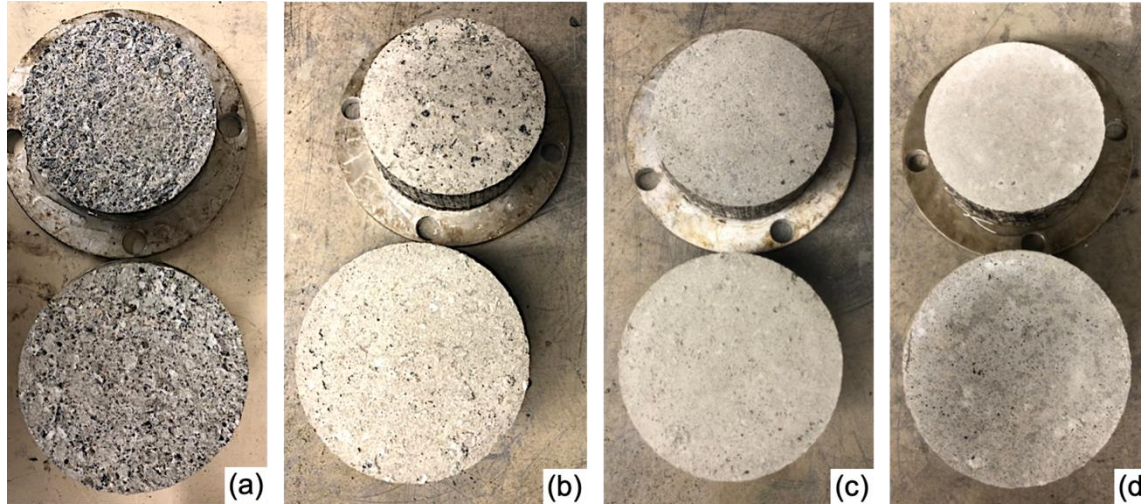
Interface bond failure of the shotcrete-concrete specimens under tensile load; (a) chipped, (b) pressure-washed, (c) sandblasted, (d) as-cast (unprepared)
